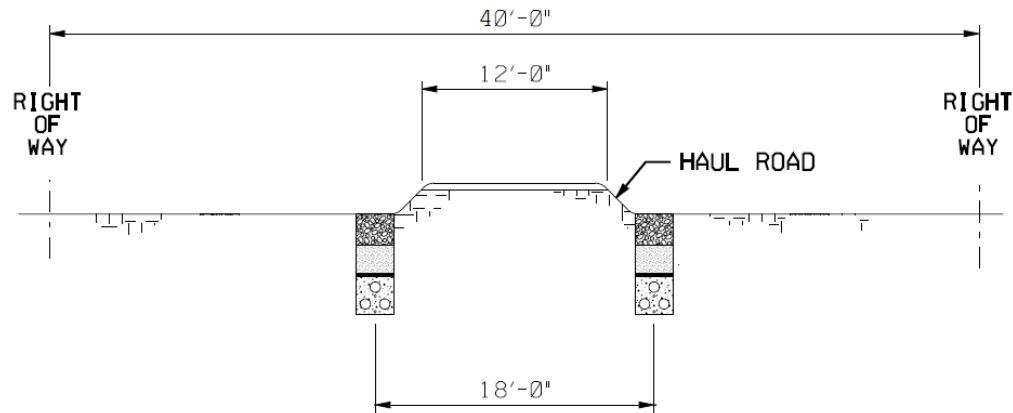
and Figure 12-3 show installation of a duct bank in a non-urban area.
